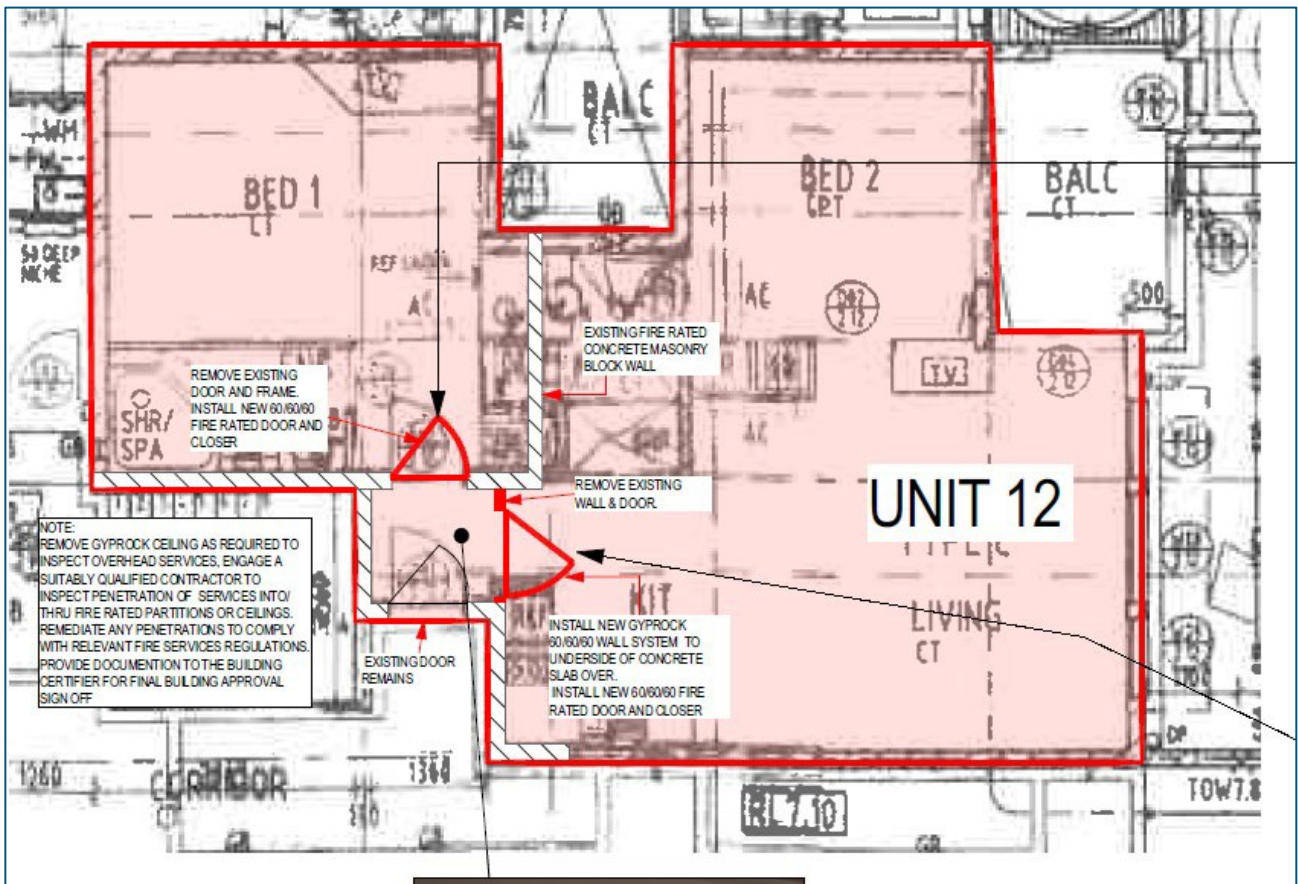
Extract from the Proposal Plan (prepared by RECS Consulting Engineers and Building Designers)
